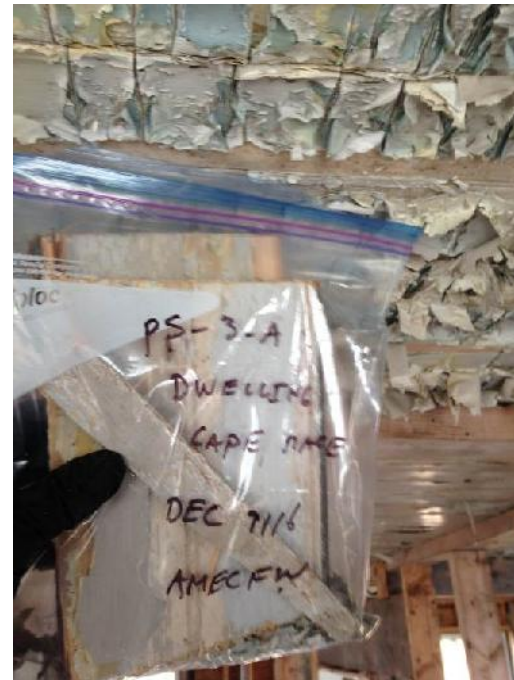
View of location of paint sample PS-3-A (including wood substrate) in Room 1 (ceiling).
